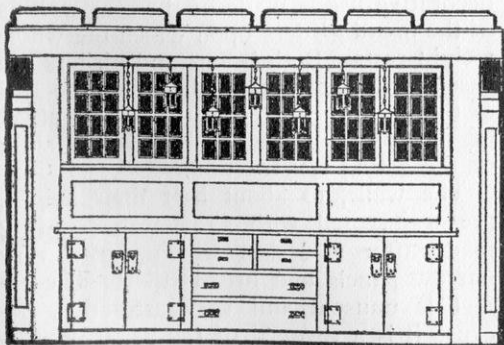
DETAIL OF DINING ROOM SHOWING FIREPLACE AND CHINA CLOSET.
